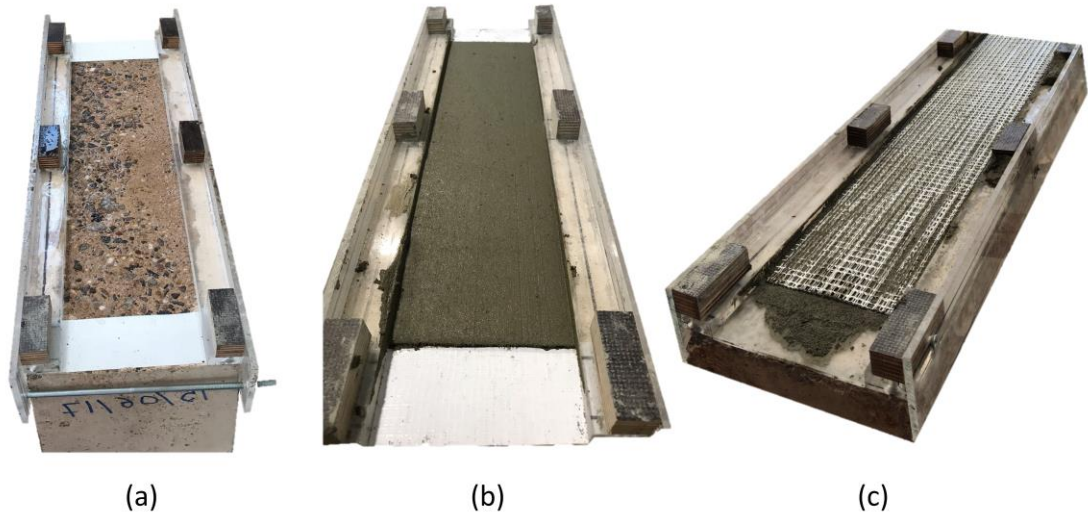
Steps of the manufacturing process of specimens for shear bond tests: (a) grinded surface prior to the application of the first layer of grout, (b) application of the first layer of grout, and (c) first layer of steel textile placed on top of the grout layer.
